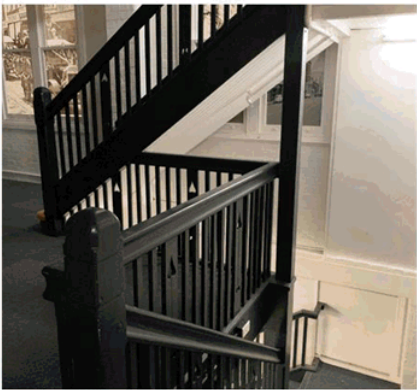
Detail of balustrade to stairs. (Source: Purcell)
